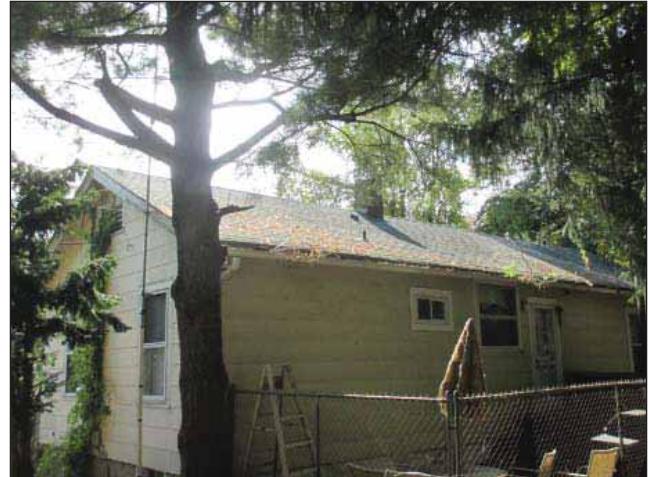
Damage to roof and fascia boards with rotting wood.
